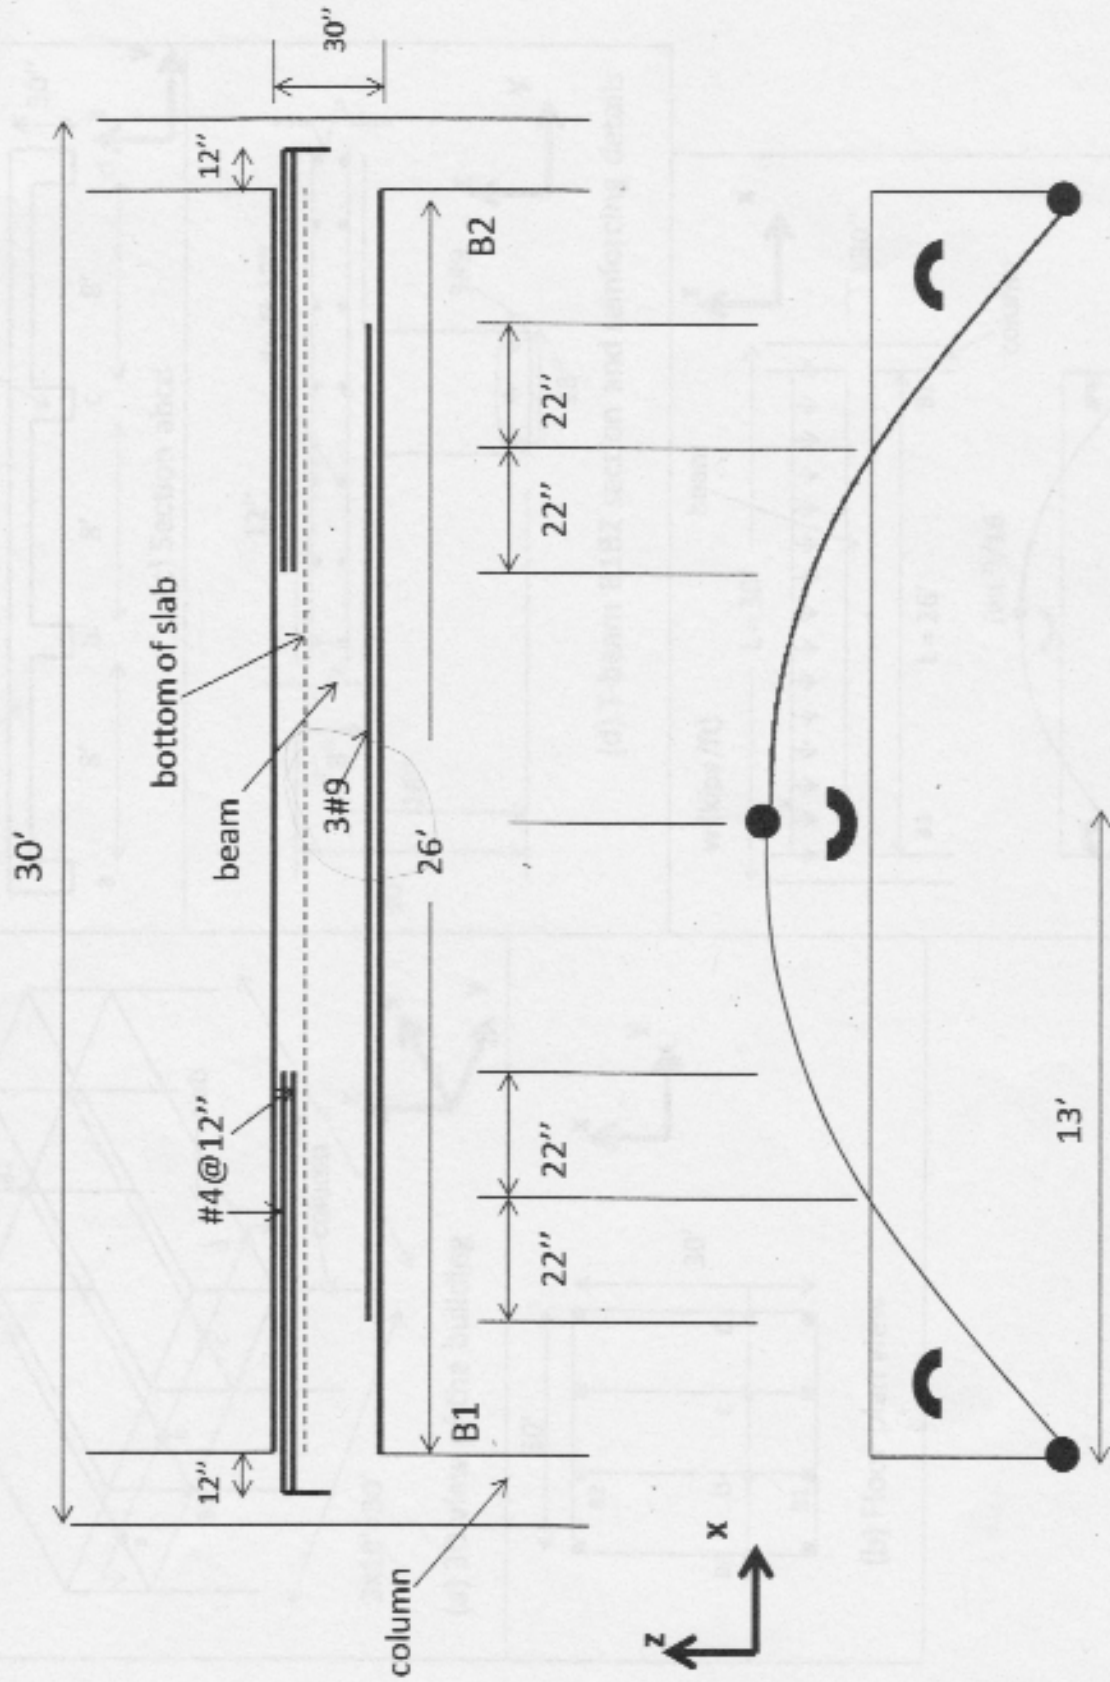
Side view of longitudinal reinforcement details of beam B1B2.
